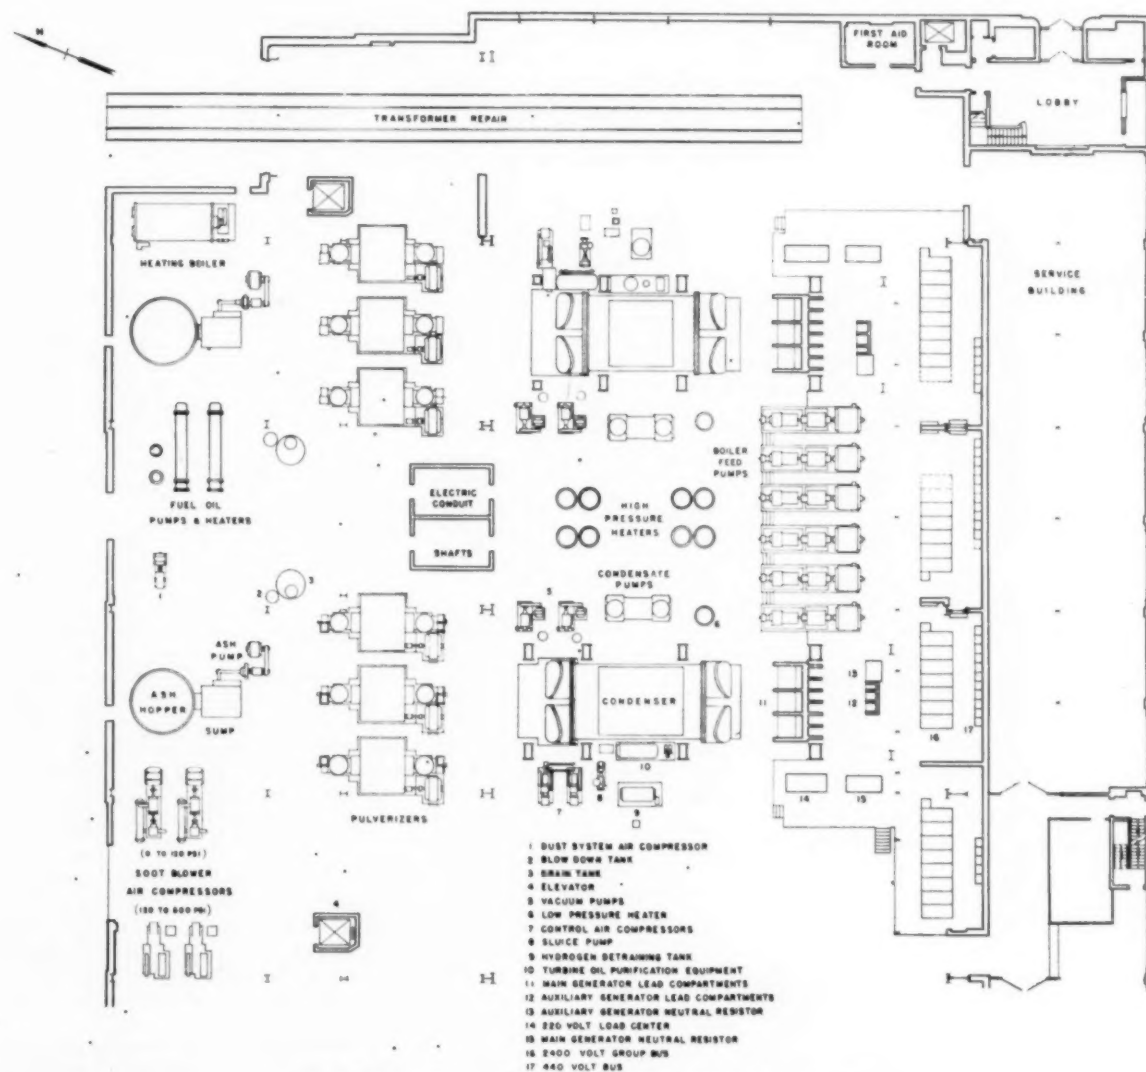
PLAN OF LOWER OPERATING FLOOR—SEWAREN
